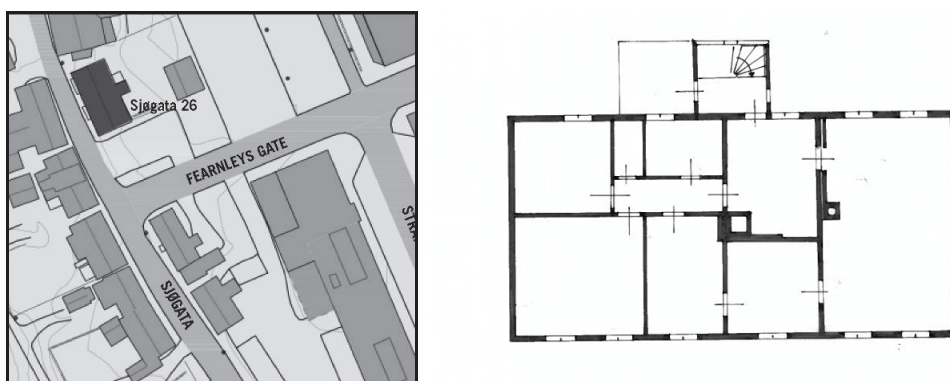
Sjøgata 26 site plan (left) and upstairs floor plan (right), (August Schmidt 2010)
